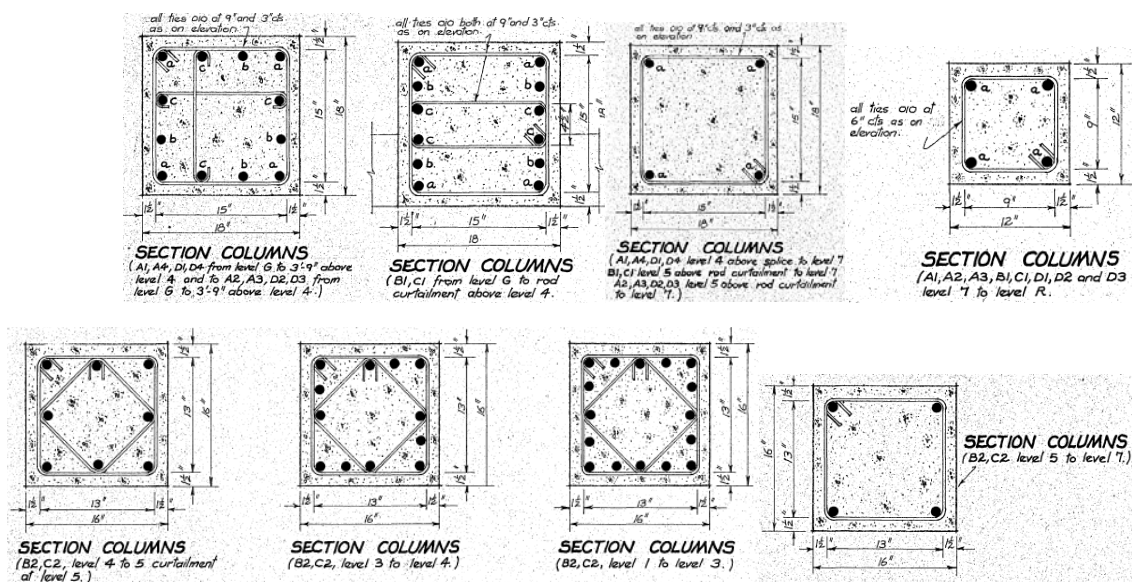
Example of column reinforcement details in Frame 1, A and D.
